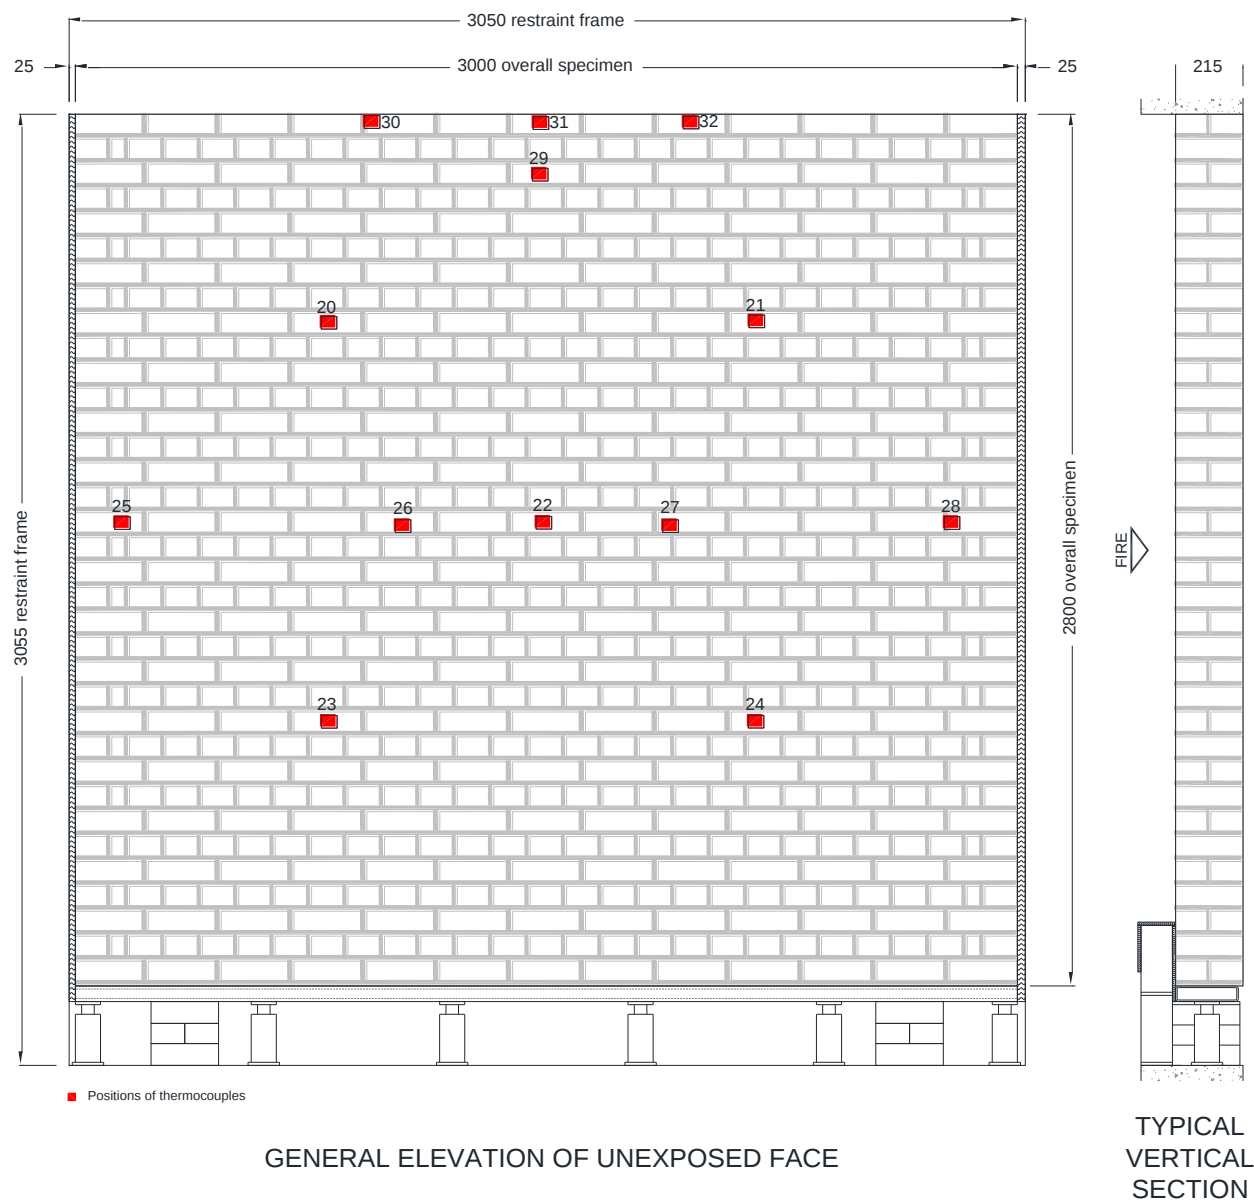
General elevation of unexposed face showing thermocouple positions & typical vertical section
